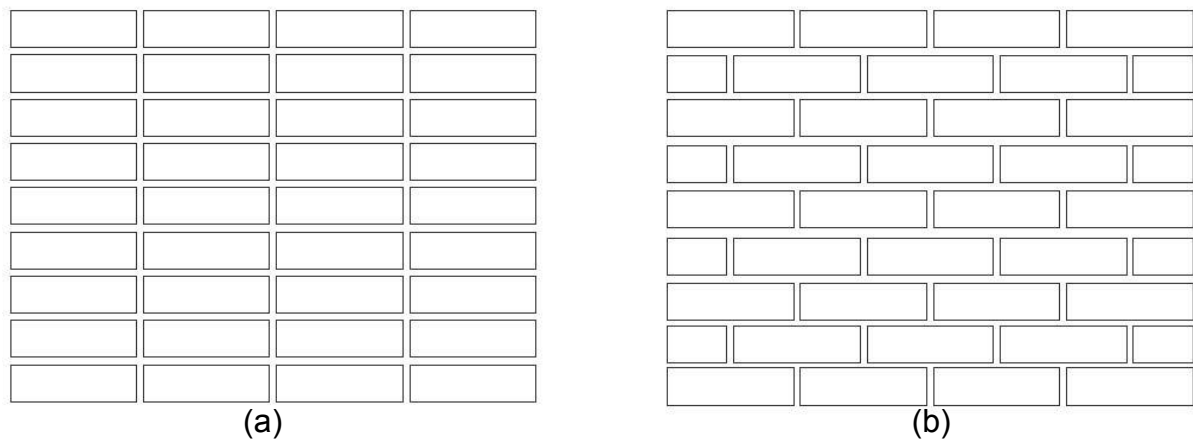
Different arrangements for brick masonry: (a) stack bond; (b) stretcher bond
